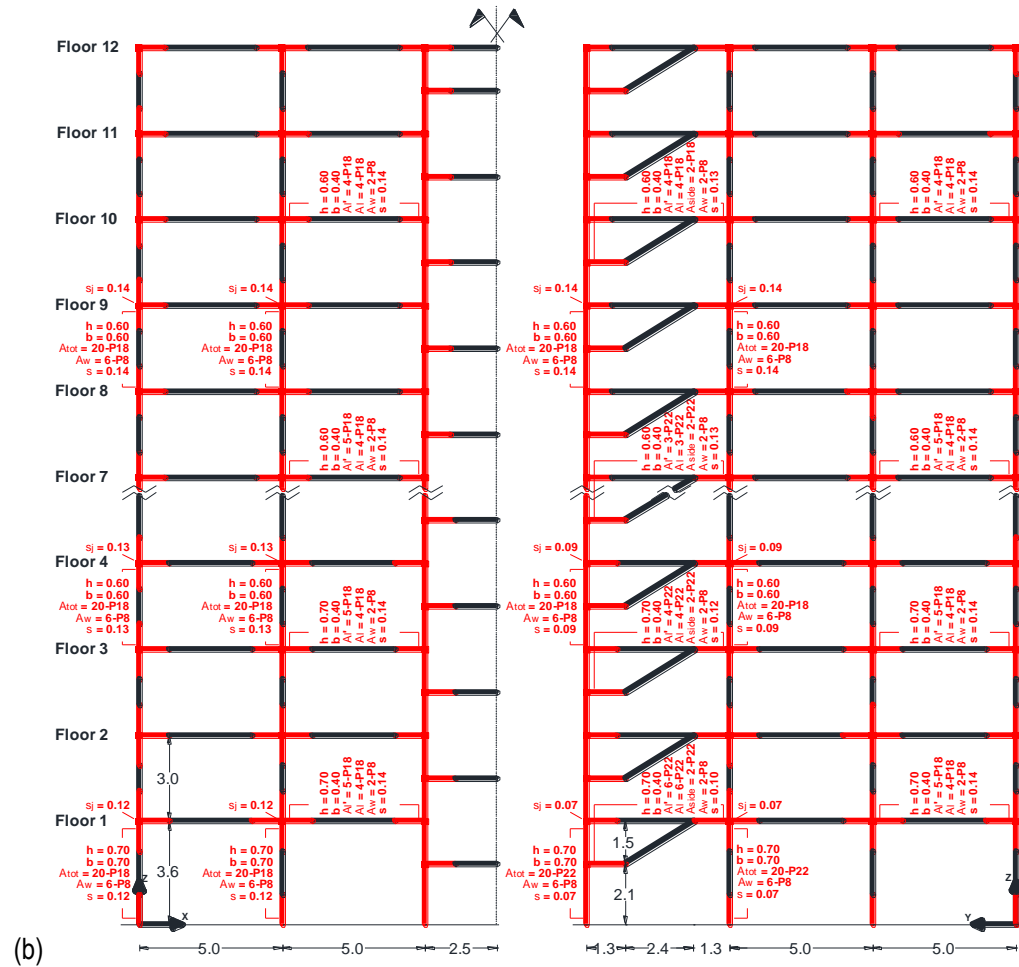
Geometrical and reinforcement details for the benchmark building designed for DCM. Legend: h = section depth, b = section width, A_l = bottom longitudinal bars, A_l' = top longitudinal bars, A_{tot} = total longitudinal bars, A_{side} = total lateral longitudinal bars, A_w = stirrup bars, s = stirrups spacing in critical regions, and s_j = stirrups spacing in joints.
